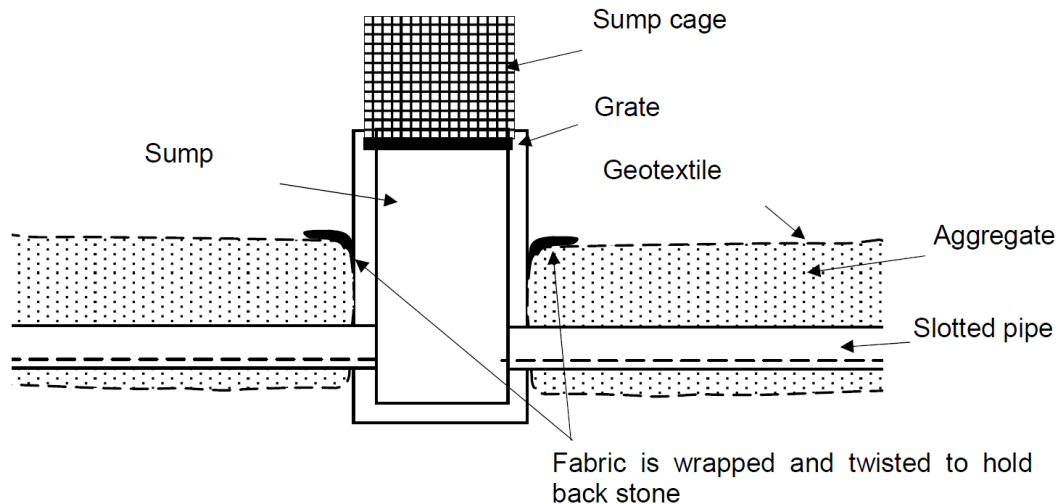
Method of joining longitudinal subsoil drain to sumps
